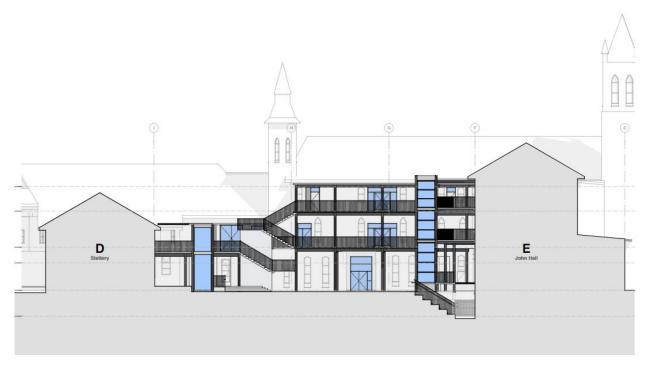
Proposed Quadrangle Elevation showing the new steel-framed walkways, stairs and lift against the rear elevation of the main buildings of the school. (not to scale)
